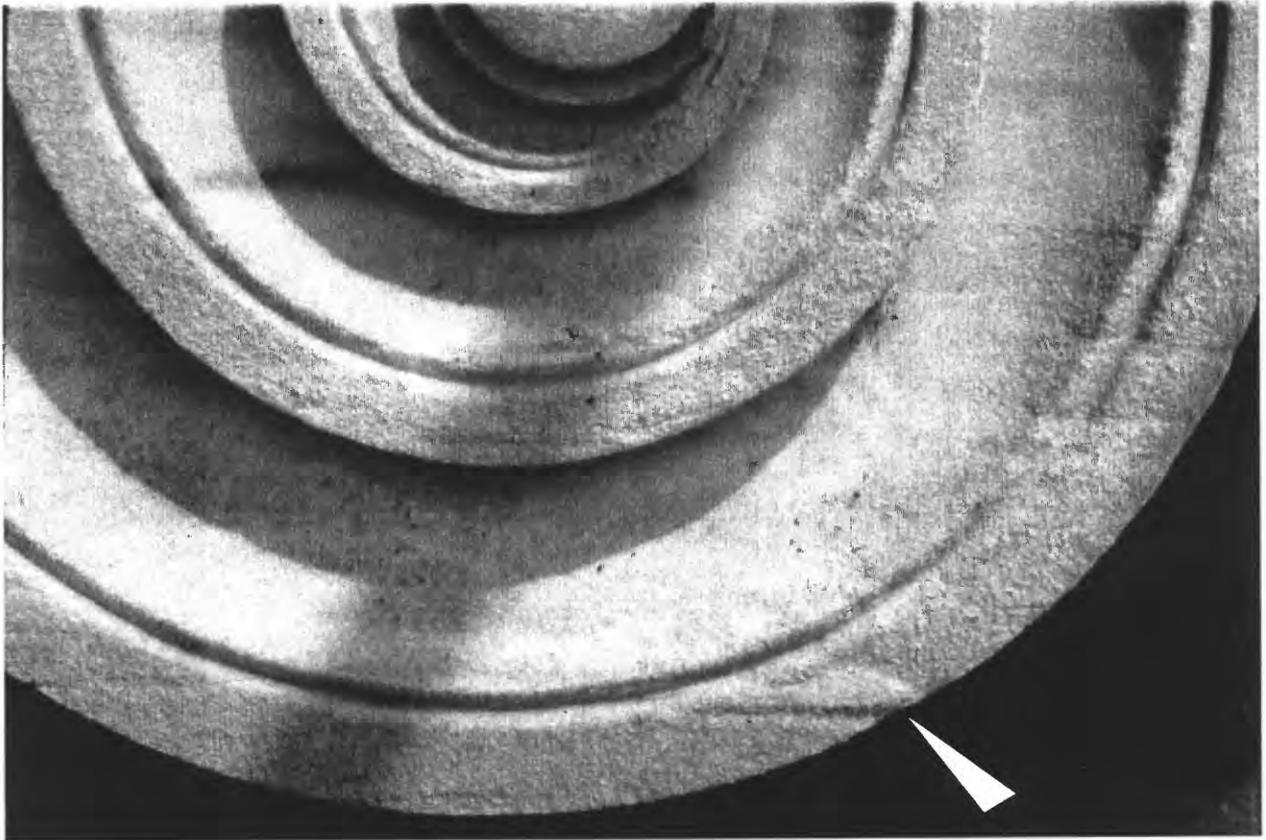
Shallow indentations on a volute face, some resemble cracks; lower half of volute 21C.
